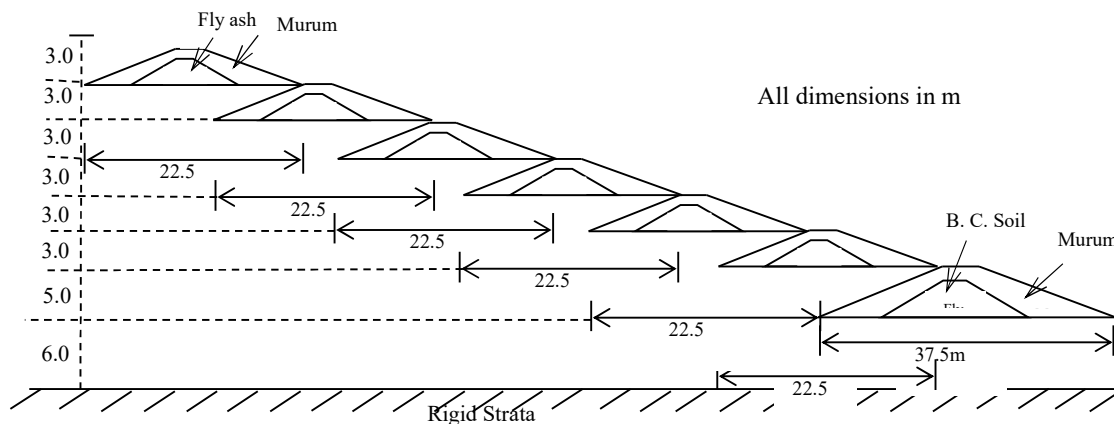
Schematic Sectional Elevation of Initial 5 m Height &amp; Successive Raising of 3.0 m Height in 6
